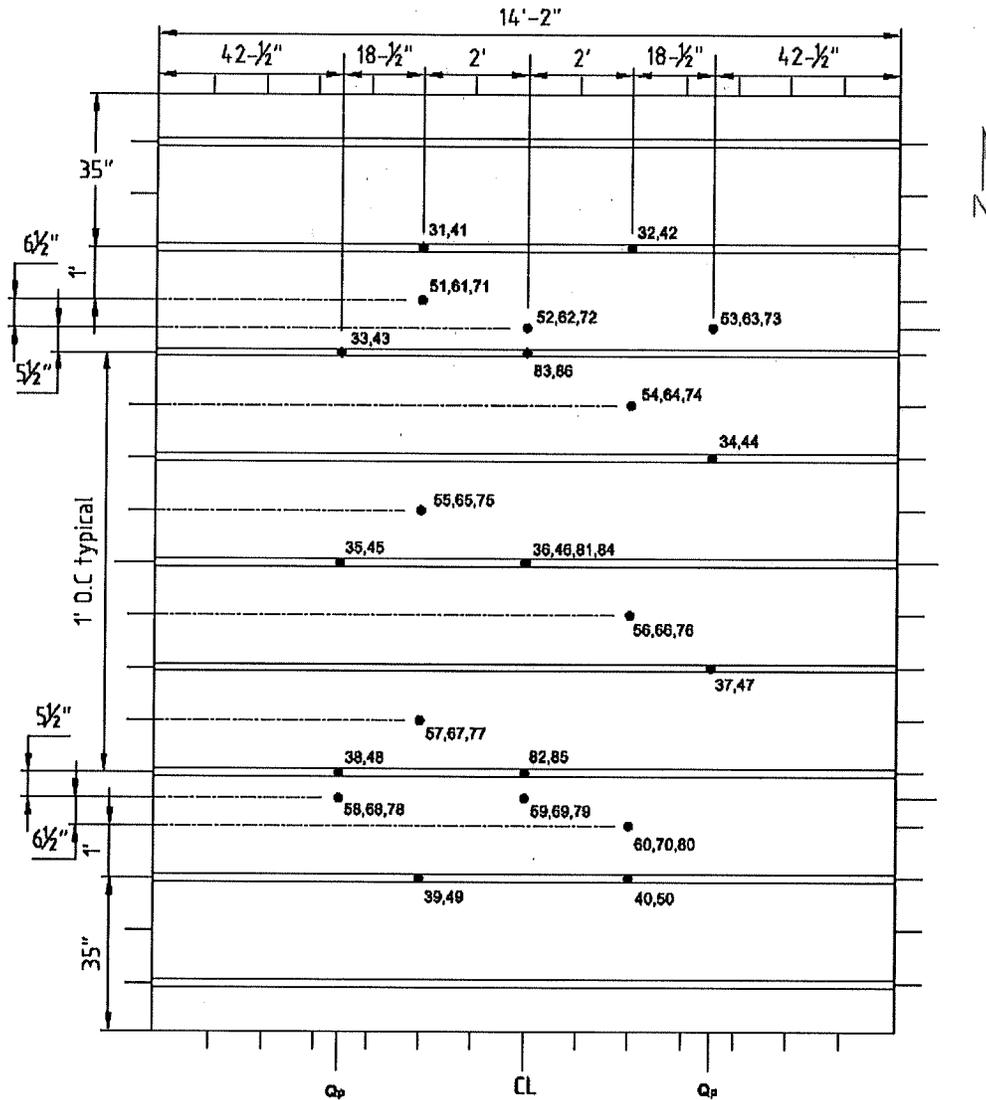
Construction Layout Section A<sub>1</sub>-A<sub>1</sub>.
